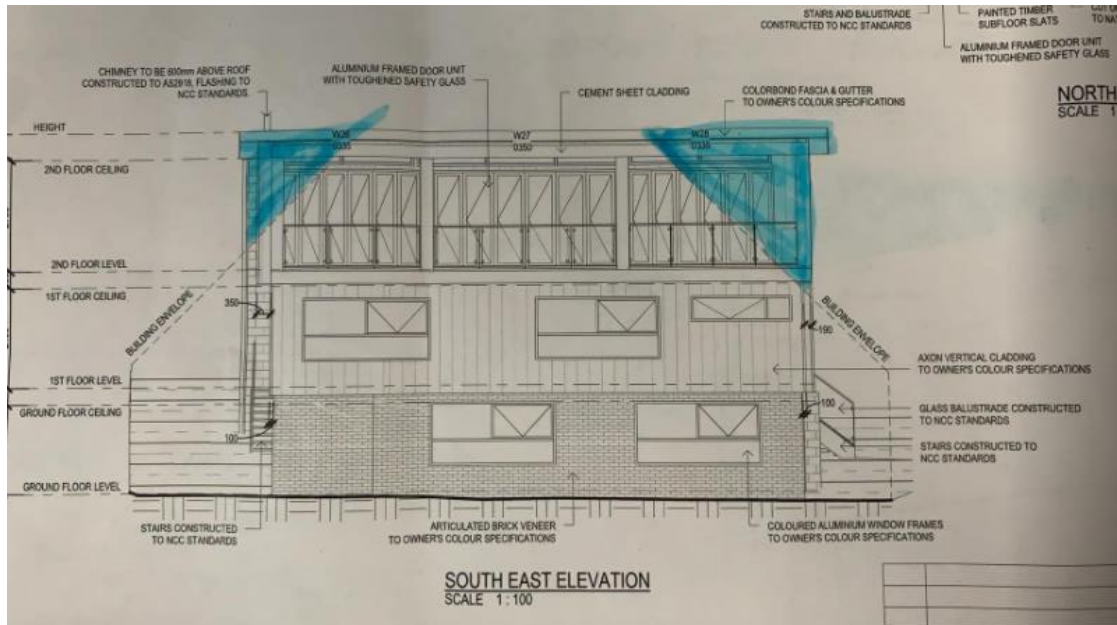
, South Eastern elevation (dwelling as evident from rear boundary of 1 Garnett Avenue)
